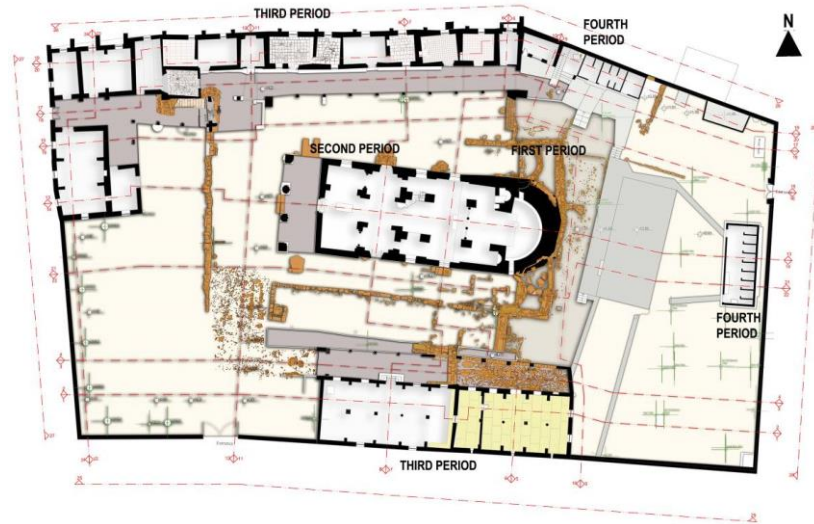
Survey drawing of the site plan, semi-enclosed spaces
